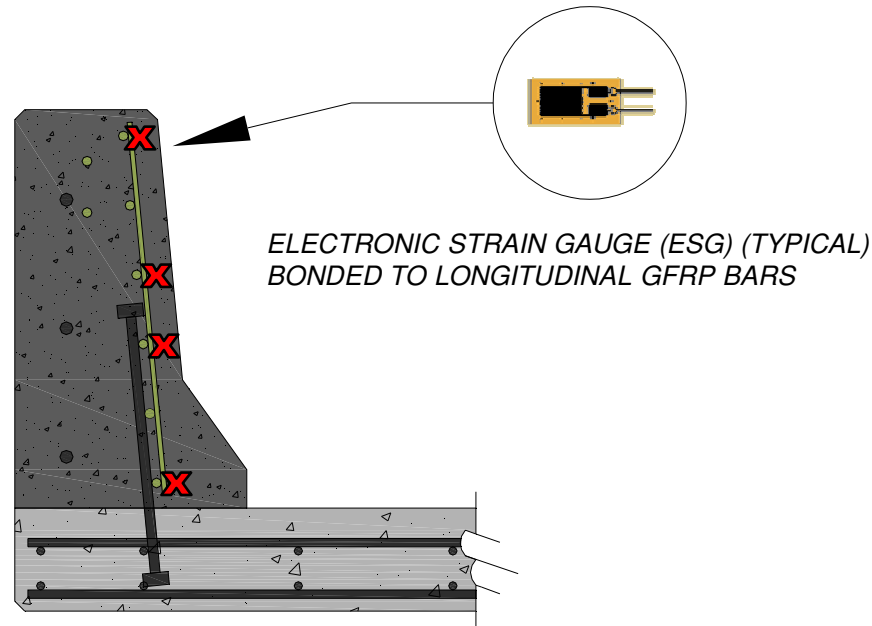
Schematic illustrating strain gauge locations on longitudinal GFRP reinforcement in the traffic barrier wall (typical all test locations)
